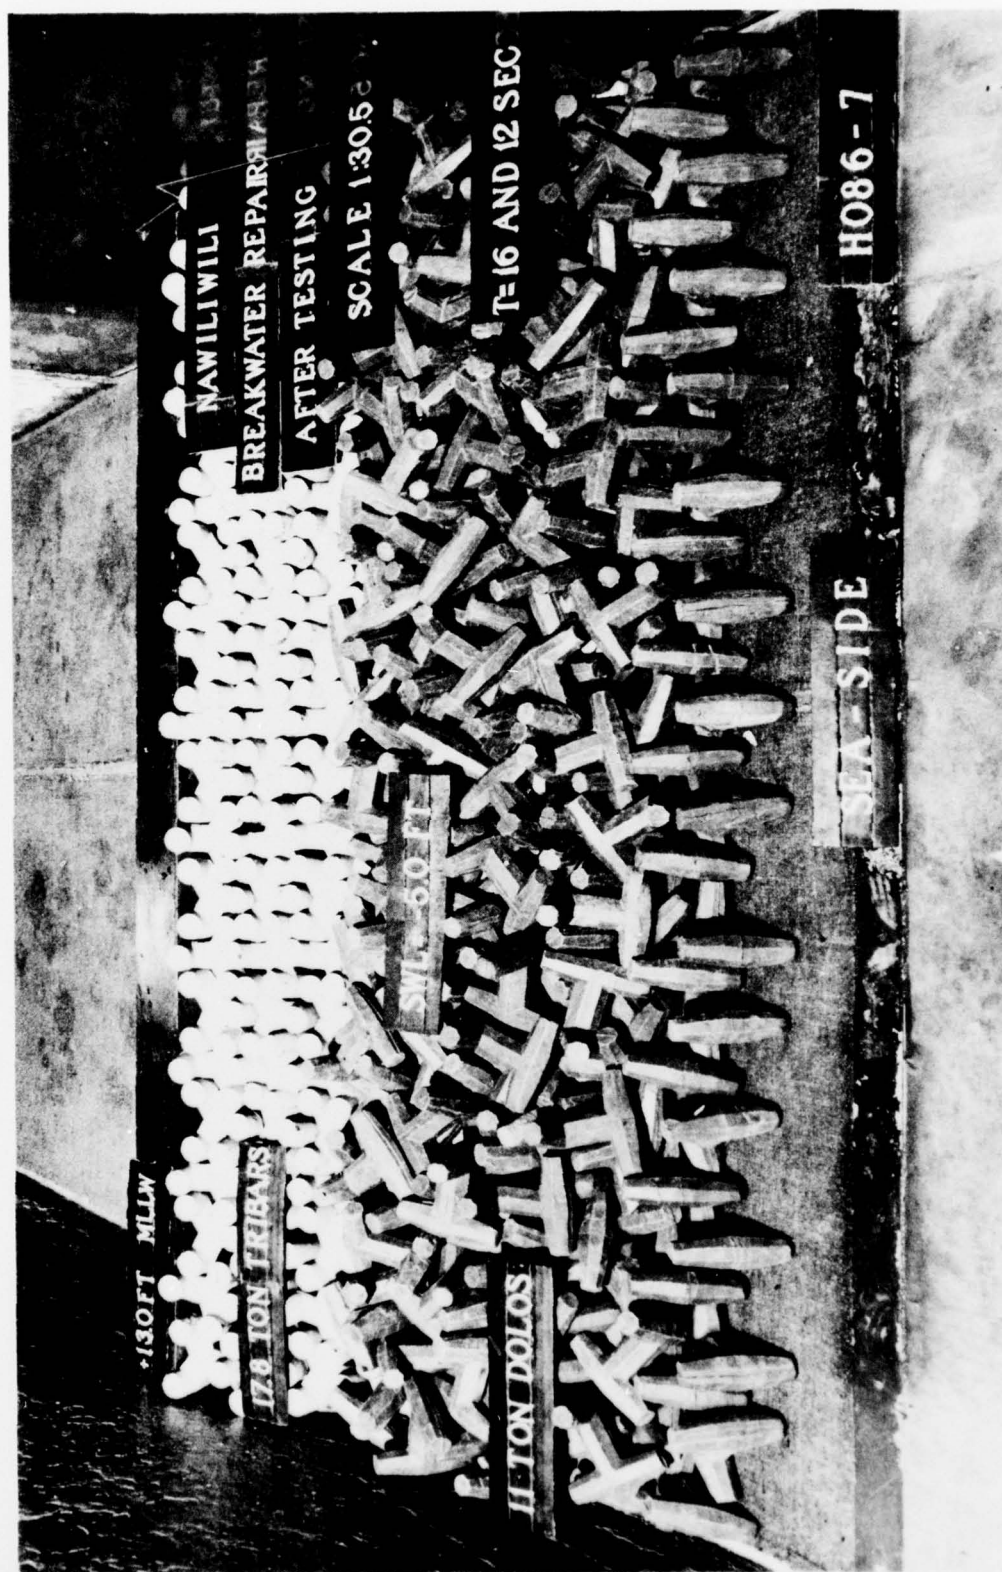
Sea-side view of test section 1 after testing with 16-sec, 8.9-ft and 12-sec, 8.4-ft waves at -5 ft mllw swl
